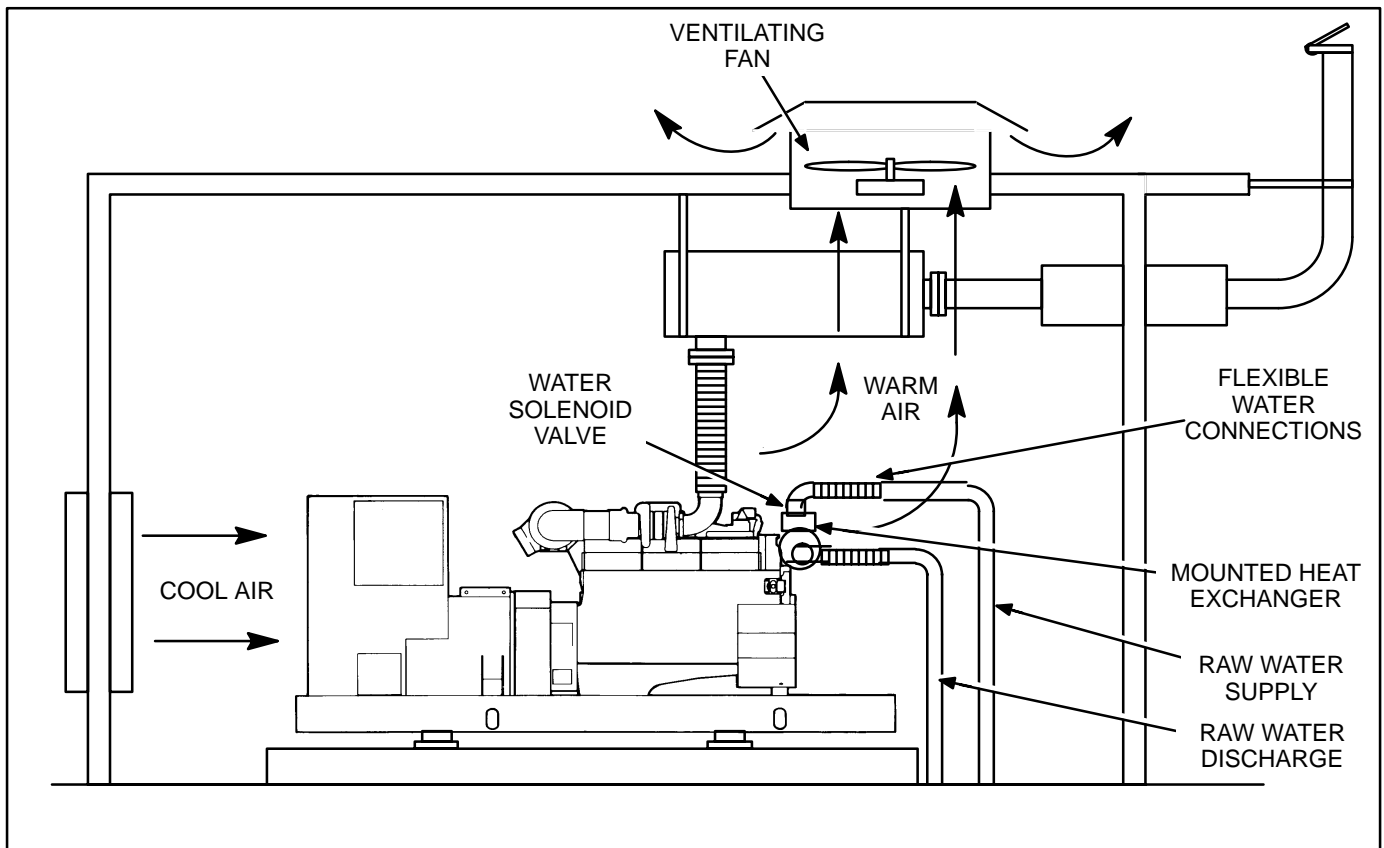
TYPICAL HEAT EXCHANGER INSTALLATION
